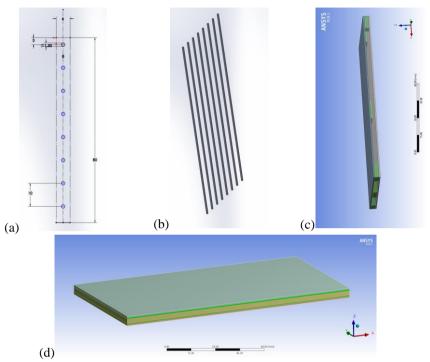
Geometry of sandwich beam (a) Cylindrical bar strut of 1.5 mm diameter and 10 mm spacing; (b) Carbon fiber strut imbedded in core; (c) Rectangle shape strut inserted in core (d) Sandwich with added aerogel layers
